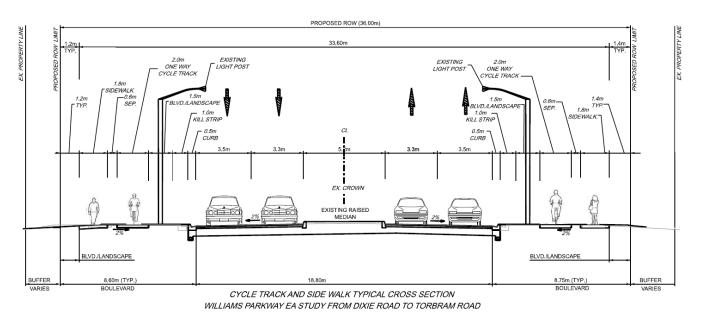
ALTERNATIVE DESIGN CONCEPT #2 - CYCLE TRACK AND SIDEWALK TYPICAL CROSS SECTION
